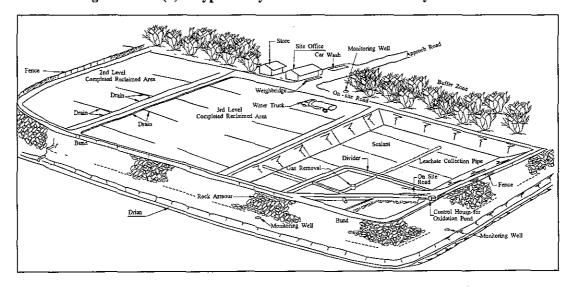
(c) Typical Layout for the Level 4 Sanitary Landfill
